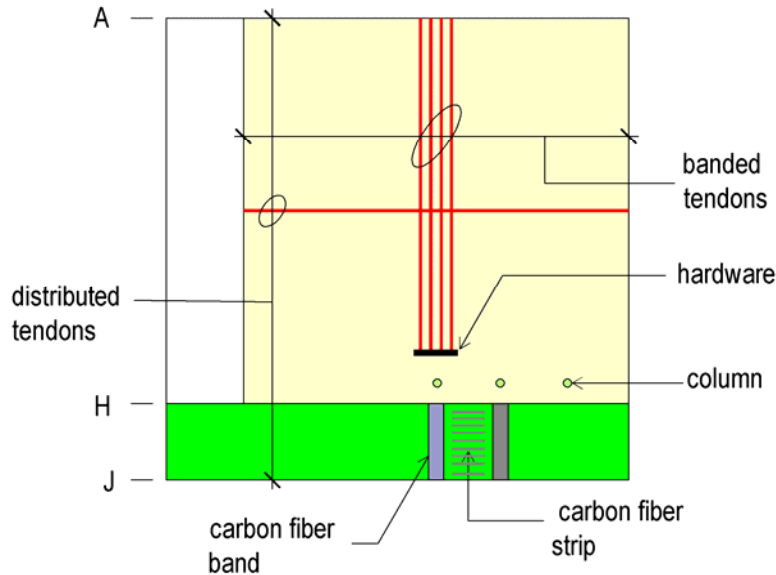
Plan; General arrangement of the proposed retrofit.
